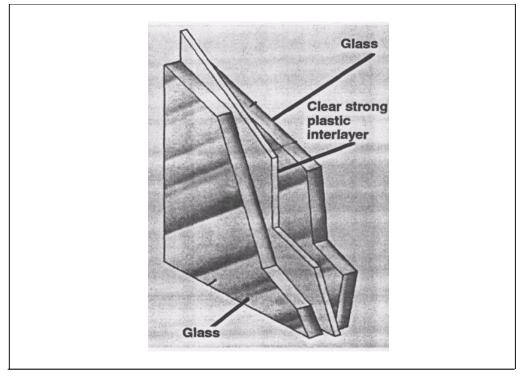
Laminated glass layers. Source: The Institution of Structural Engineers, 1999
